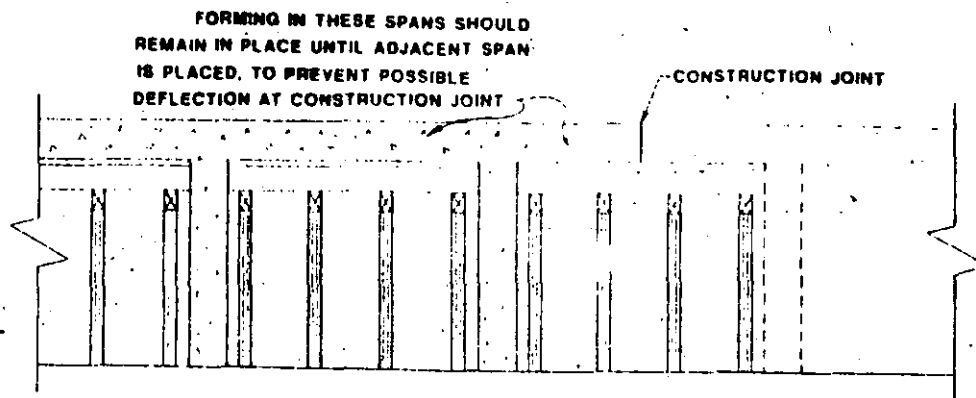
Forming and shoring restraints at construction joints in supported slabs
